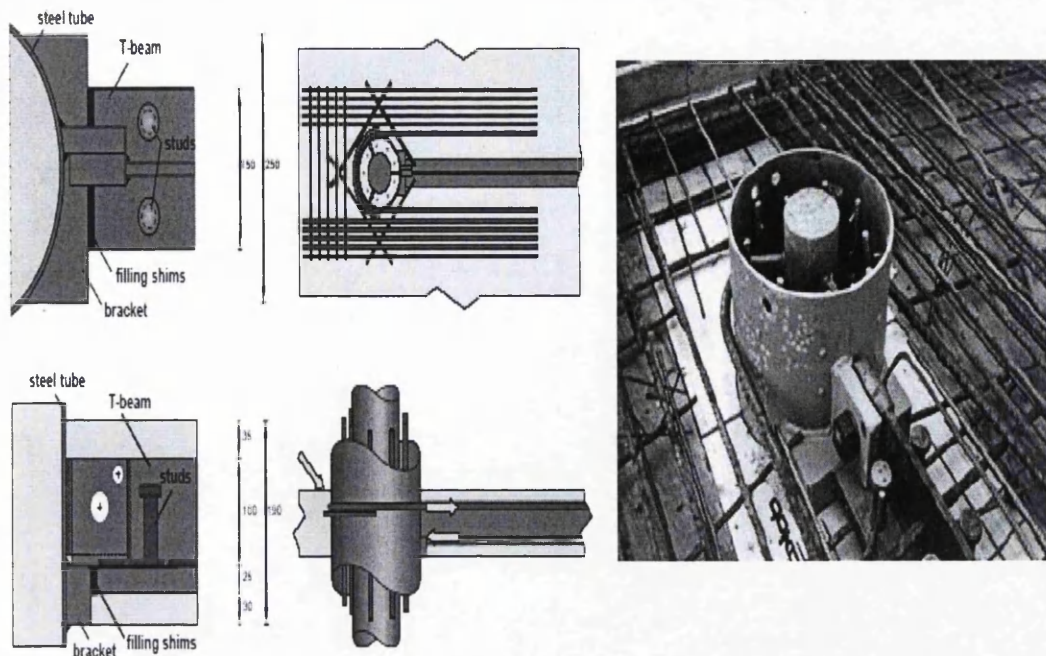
Actual configuration of a joint between a column and a slim floor beam used at the millennium tower [14].
